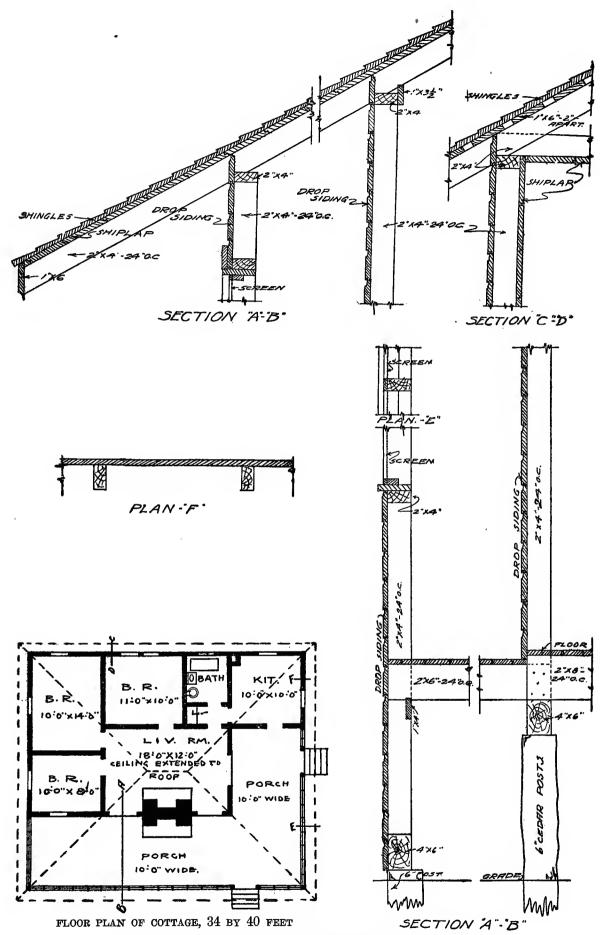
SUMMER COTTAGE CONSTRUCTION
